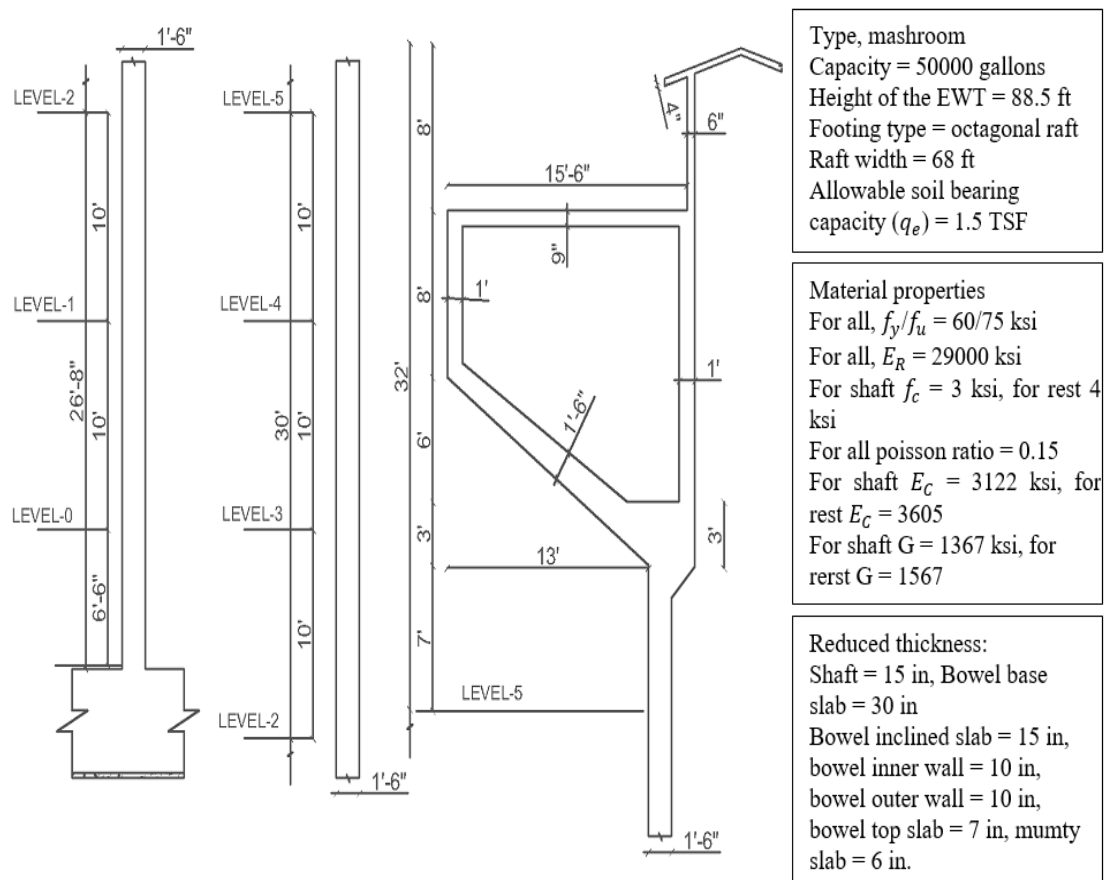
Layout of Elevated Water Tank and Related Information
